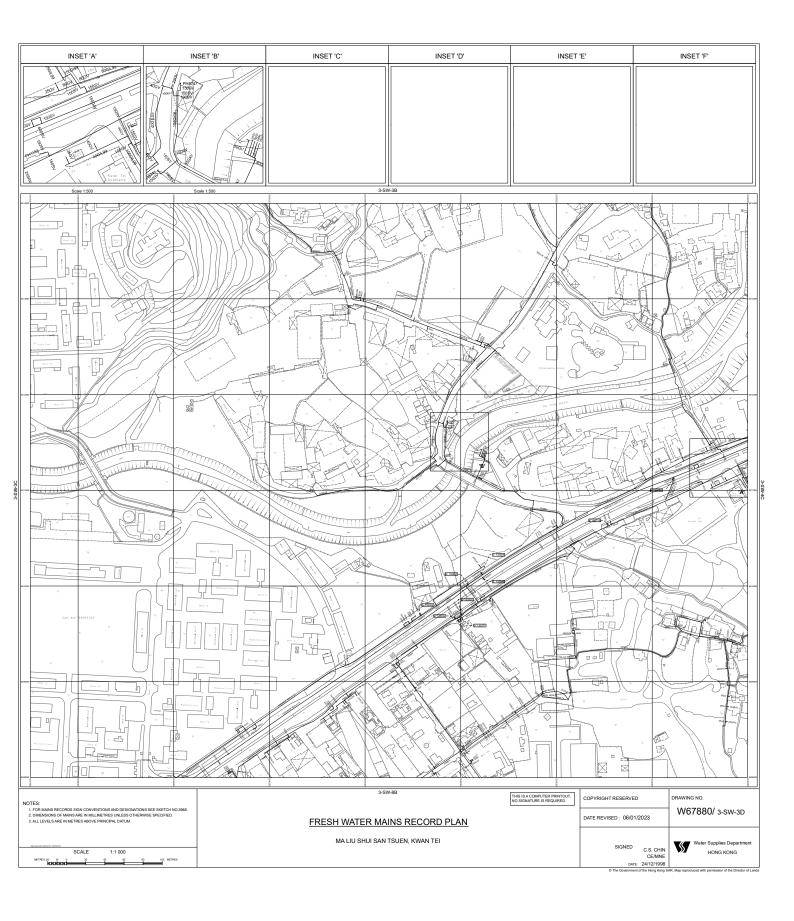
Existing Fresh Water Mains and Proposed Connection Pipes for the Site
